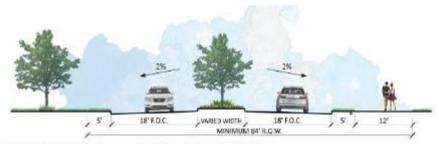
Divided Collector Roadway Design Option 8 (Minimum 84' Right-of-Way)
